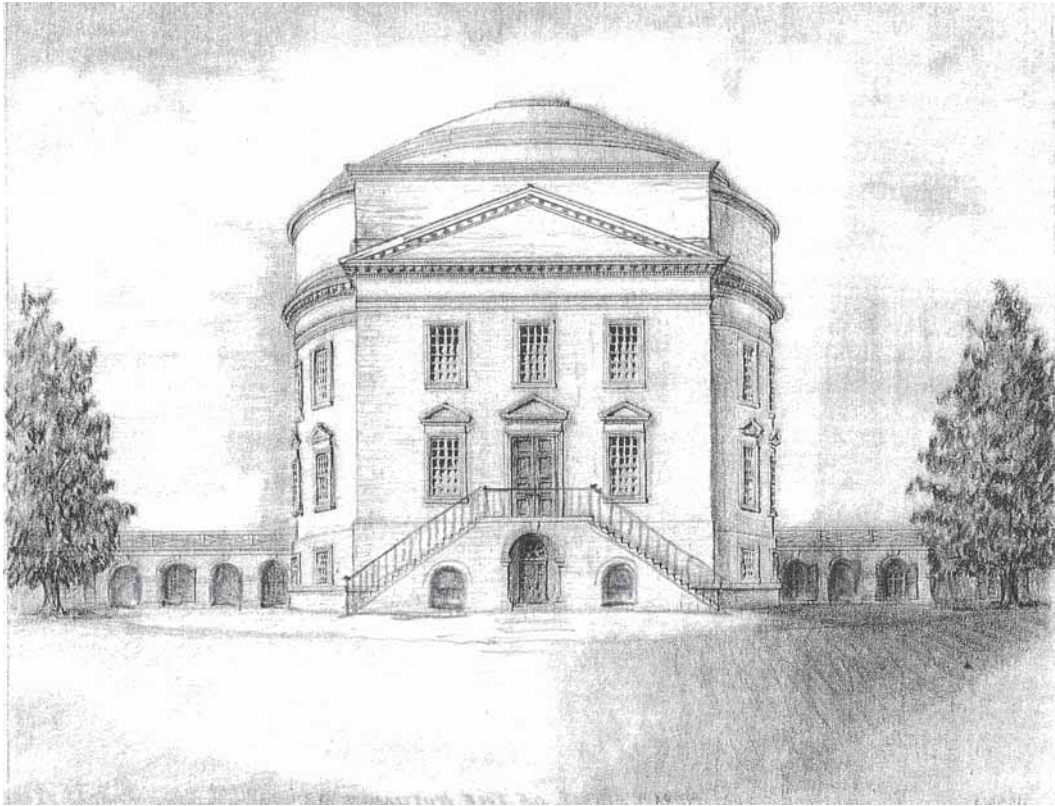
Revised conjectural view of the north elevation, Douglas Bucher, JGWA, 2007. Note the pediment, the openings in the north wall of the stair platform; the stair railings; and the open arcades of the south terraces. [JGWA, 2007]
